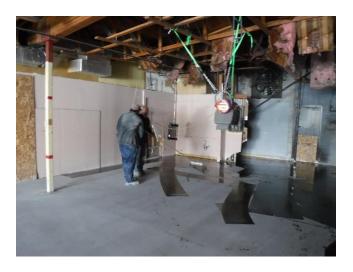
Typical primer coat installation activities for the vapor barrier installation
